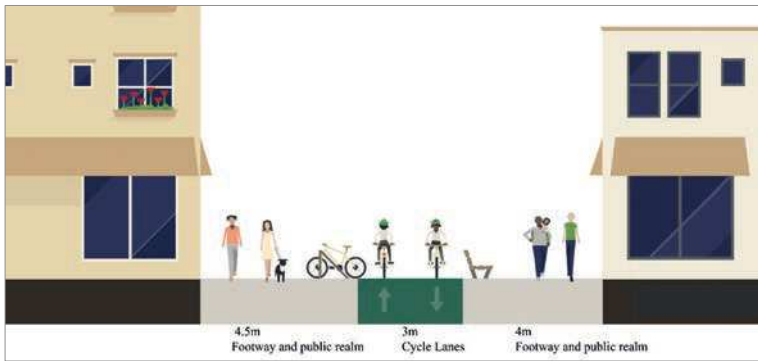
High Street Indicative Proposals (narrow cross section) © Street Mix
